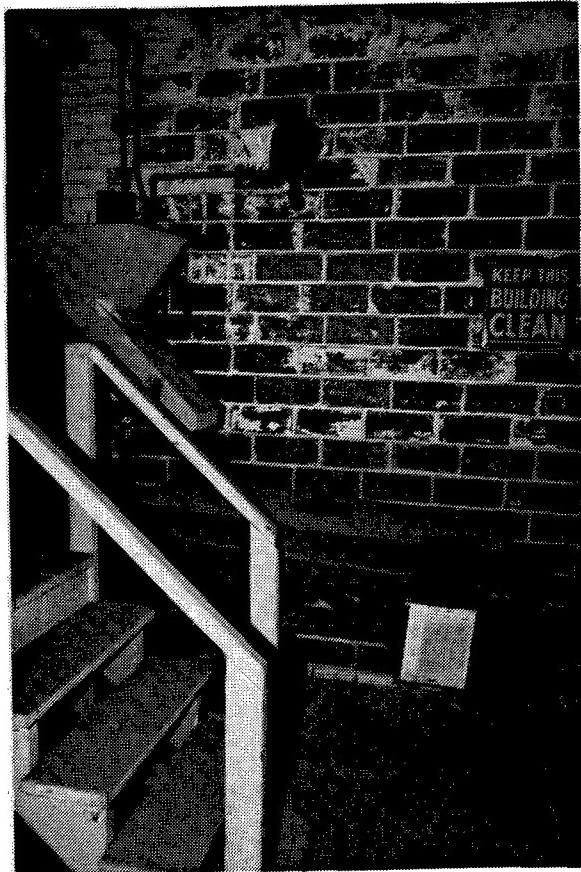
Building DT-12: Interior view of this building showing a sifter.
